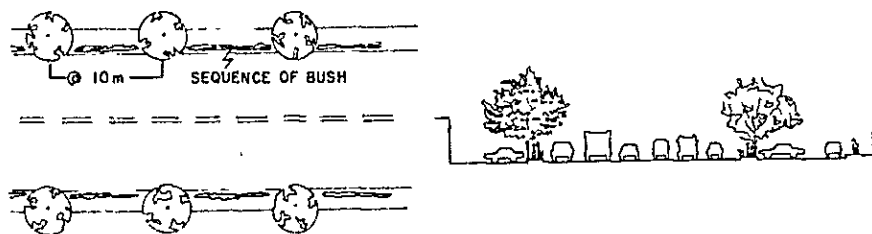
TYPICAL STREET PLANTING PATTERN
